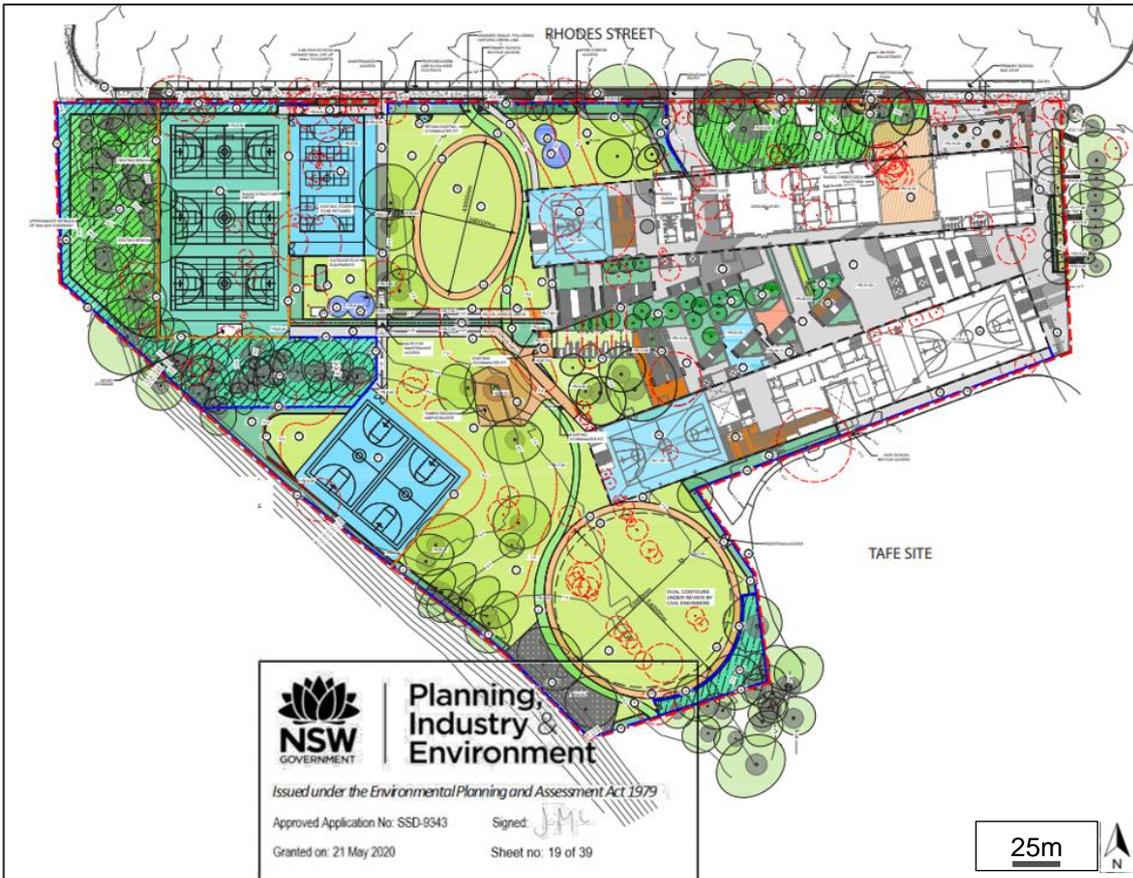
Approved landscaping site plan (Source: SSD 9343 Approved Plans 2020).
